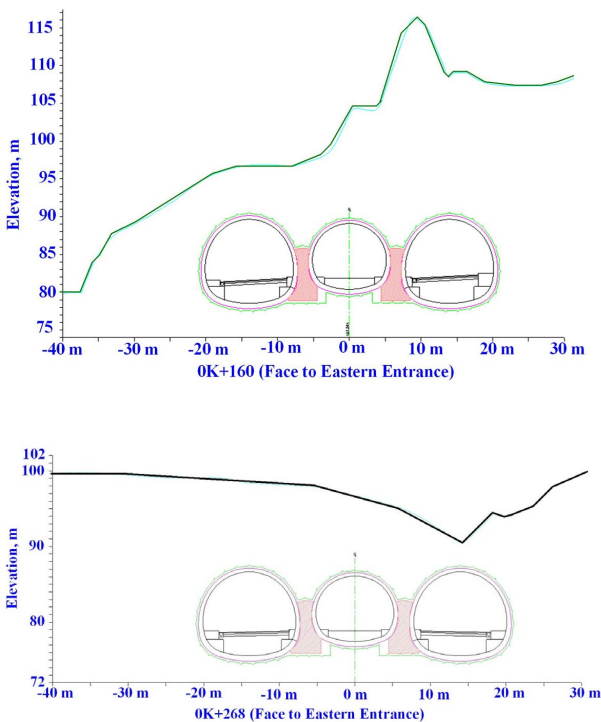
Tunnel transverse profile (0K+160, 0K+268).
